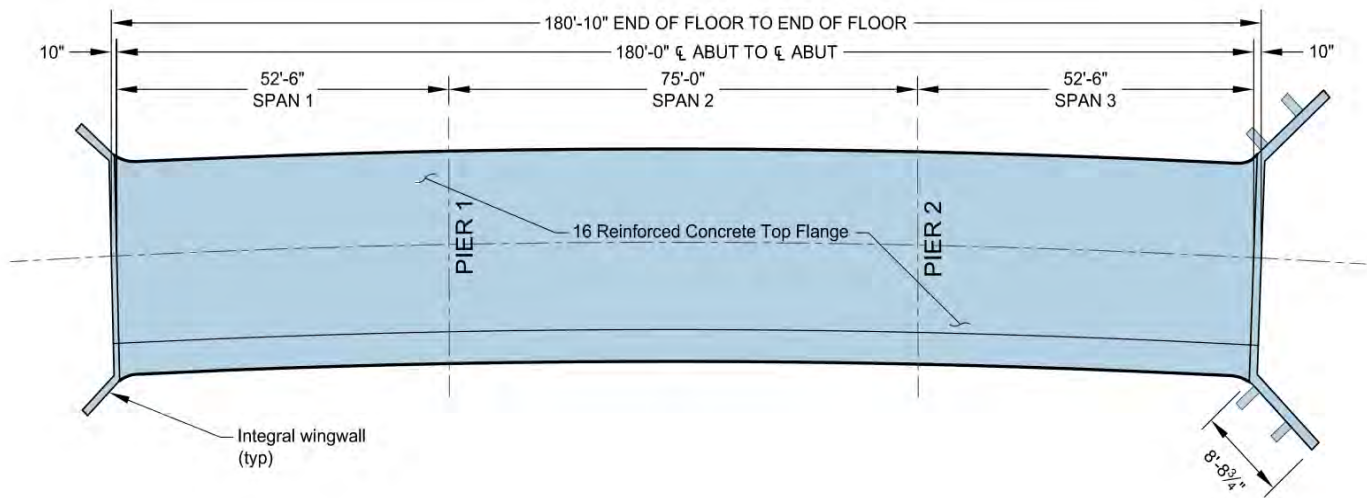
EI.24.4- 2: Plan view of concrete rigid frame
